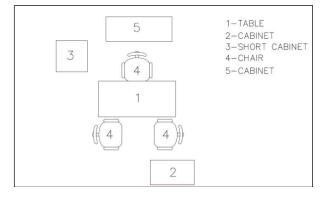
Yapı Kredi Bank Izmir branch floor plan
